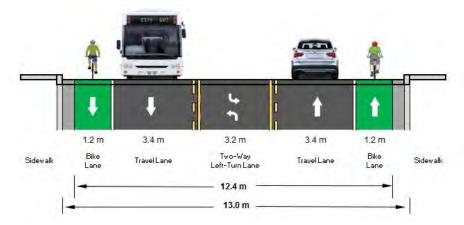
Proposed Road Diet Configuration between North Street and Sackville Road (Section A)
